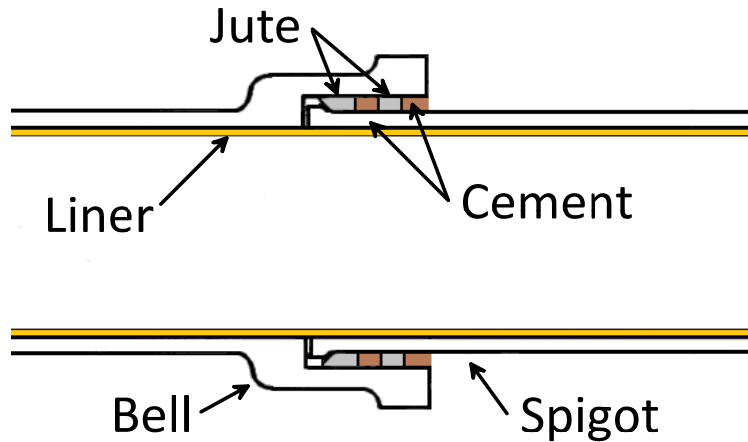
Schematic of Cement Caulked Joint for 6 in. (150 mm) Pipe Specimens
